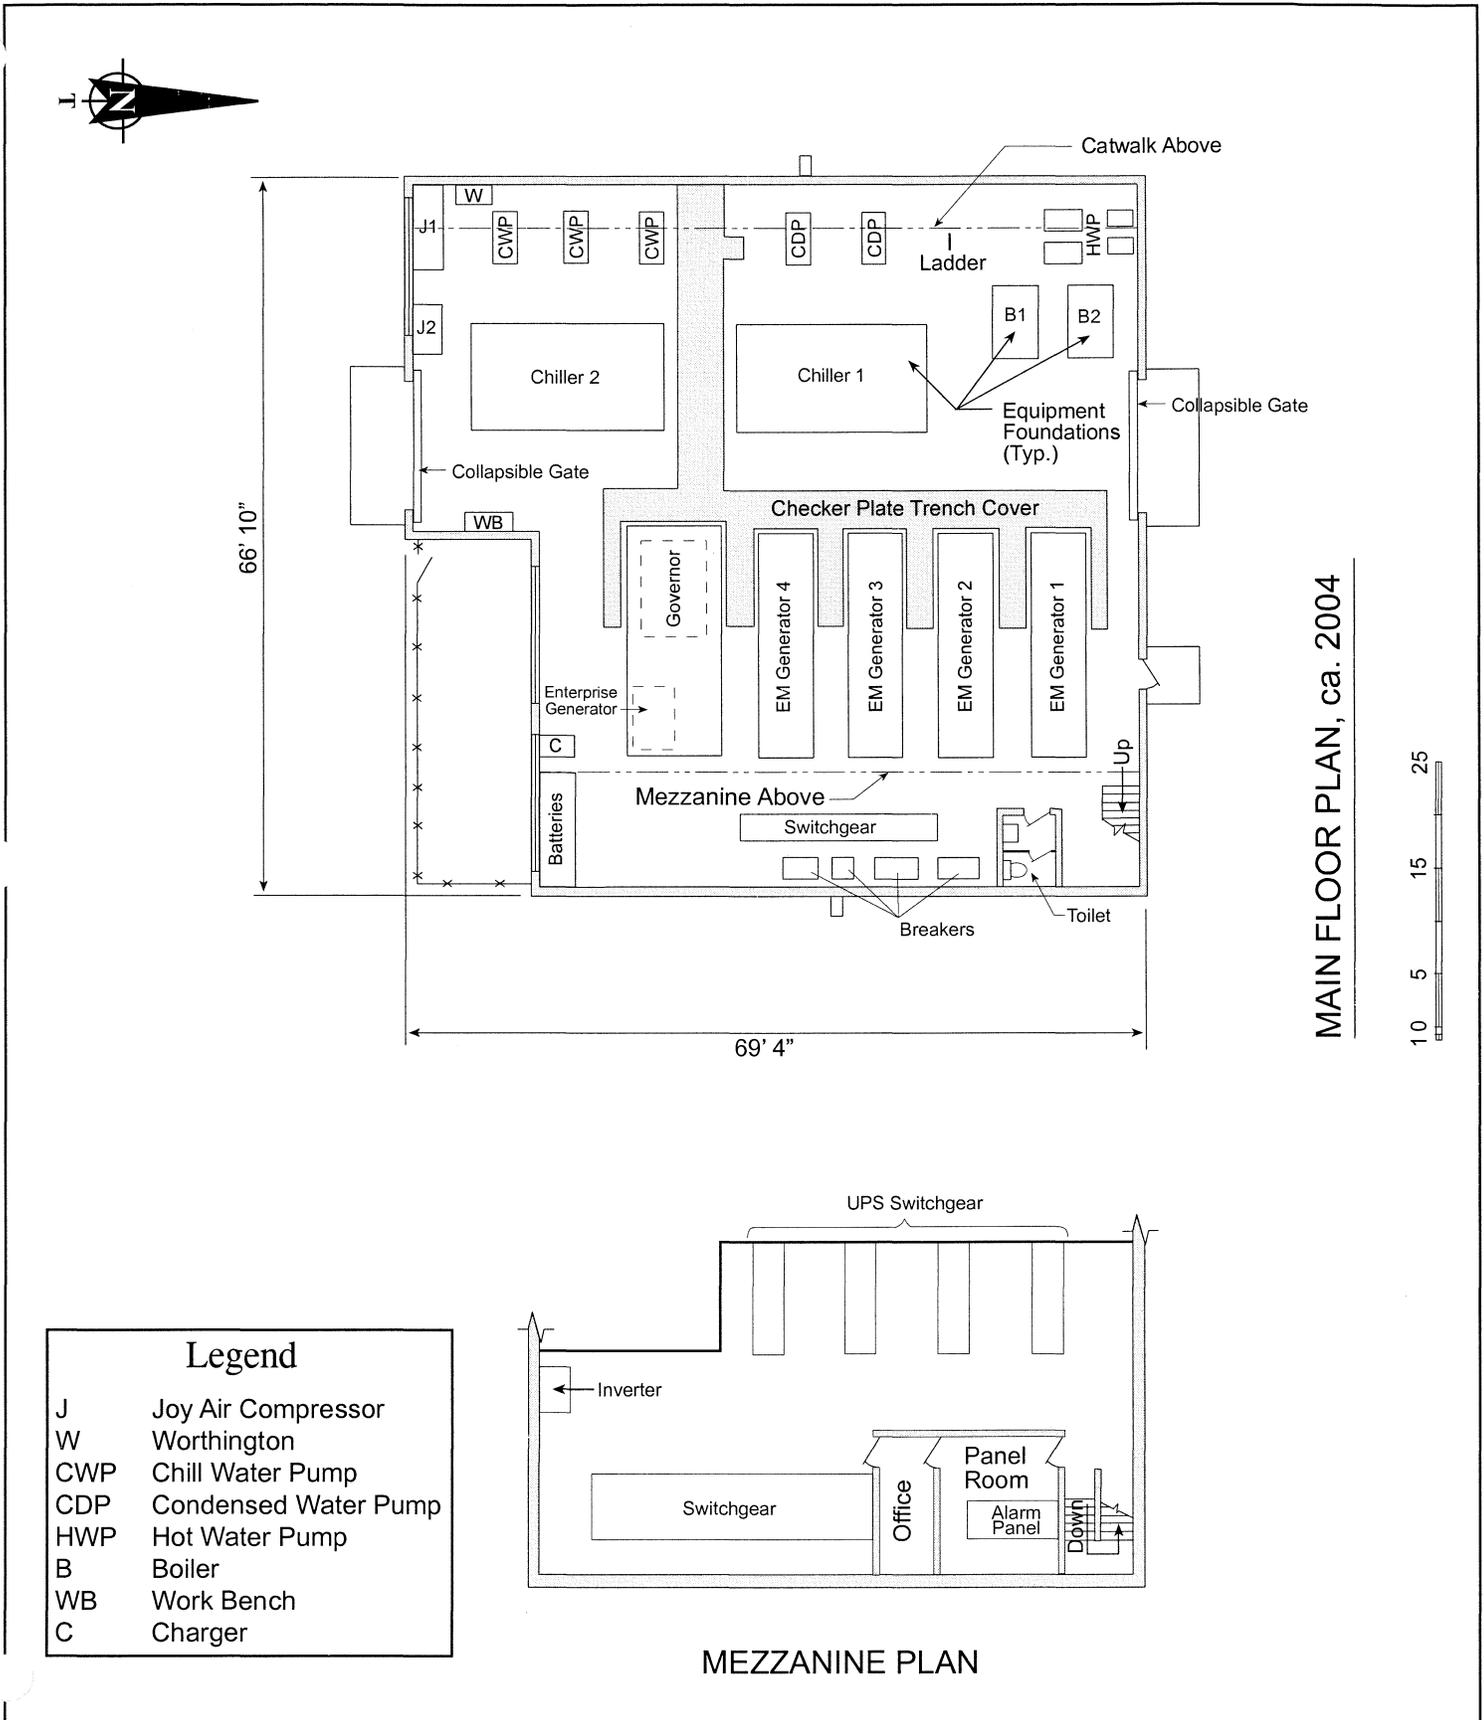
Building 2606, Floor Plan with Equipment Layout, circa 2004
